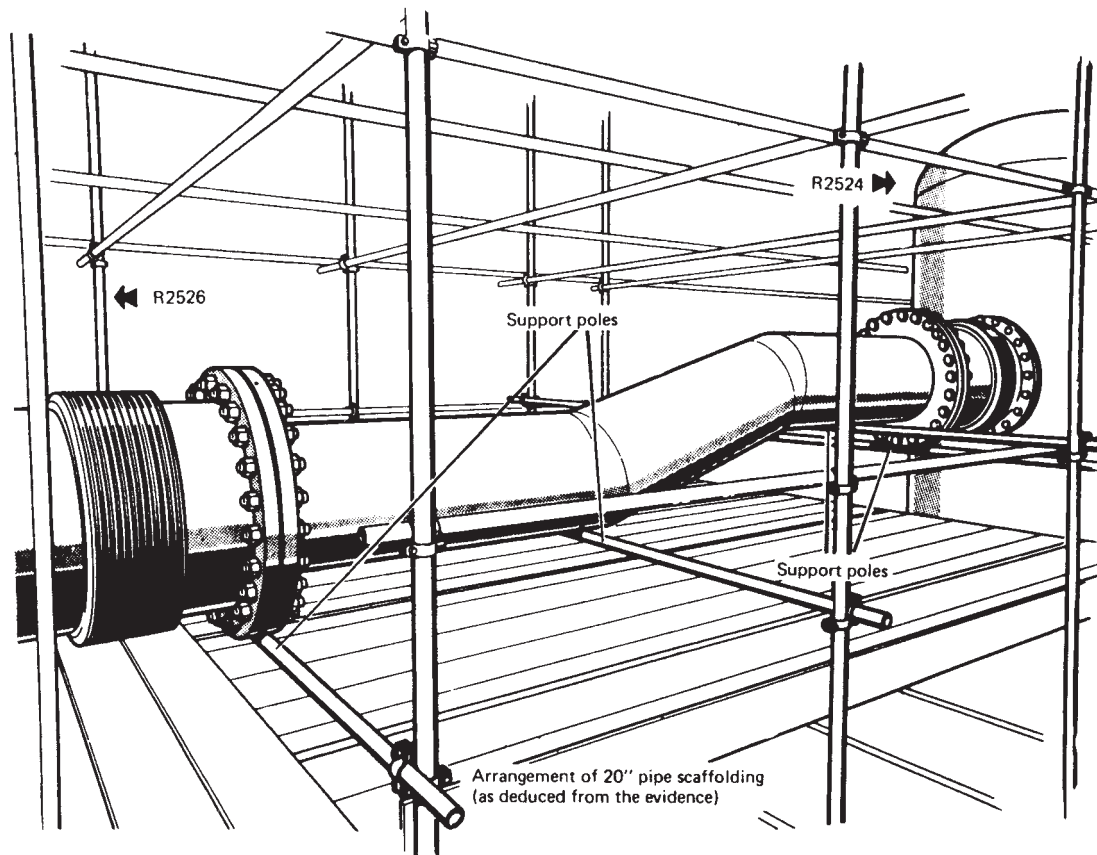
Arrangement of the 20 in bypass pipe and scaffolding at Flixborough (R.J. Parker, 1975)
